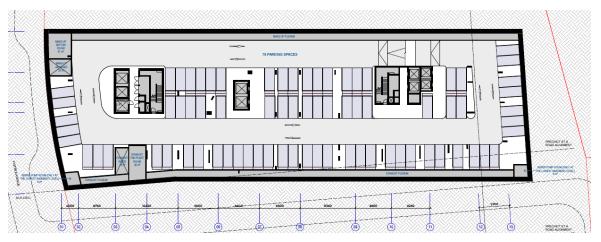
Indicative basement car parking layout (Building 2 and 3)
